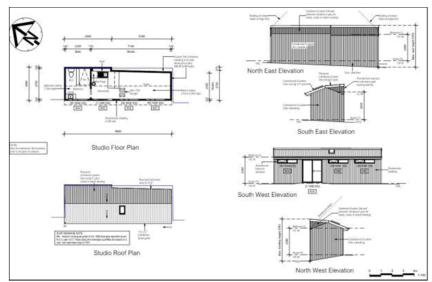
the proposed studio at 8A Kennerley Street, West Hobart.
